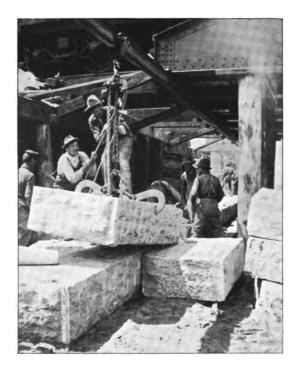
EIGHT-INCH I BEAM, TROLLEY AND TWO-TON HOISTING BLOCK USED IN LAYING DIMENSION STONE IN ABUTMENTS.
